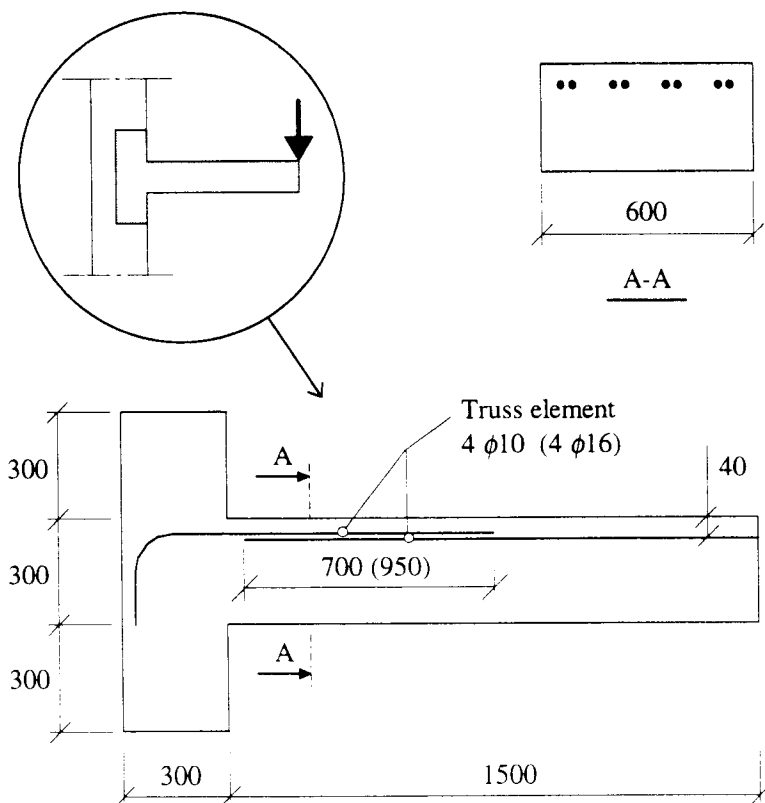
Dimensions of the cantilever beam model and position of the reinforcement bars. Amount of steel reinforcement and anchorage length of the beam with the high reinforcement ratio are given between brackets.
